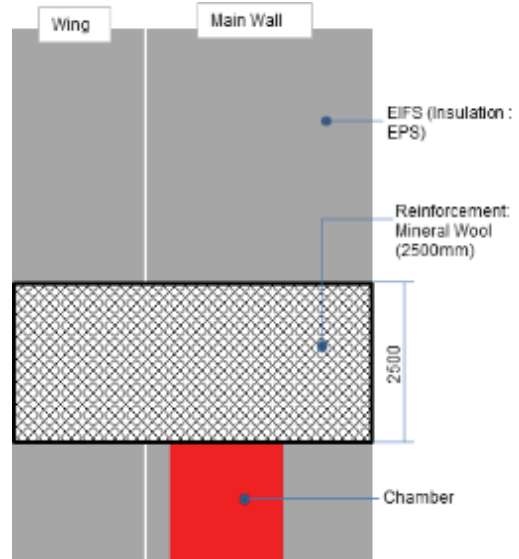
Elevation of EIFS 3 (Reinforcement: Mineral Wool 2,500 mm)
